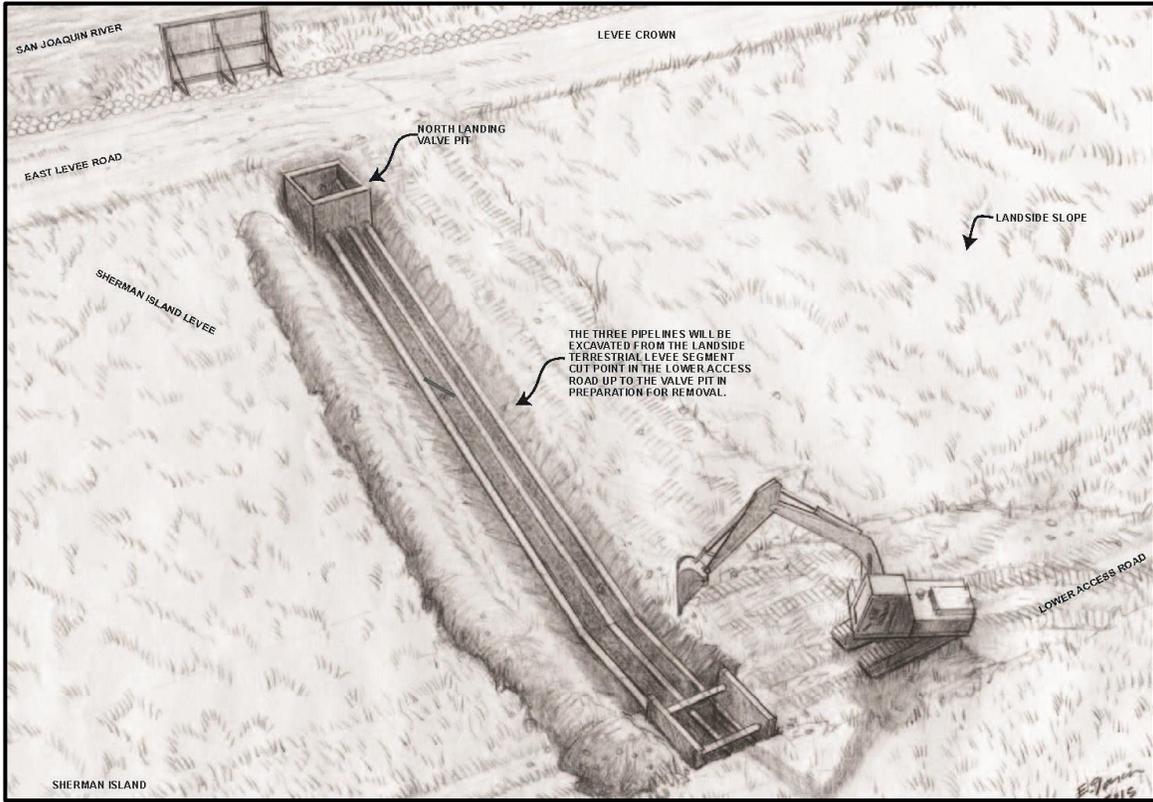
Landside Terrestrial Levee Segment Excavation and Removal
